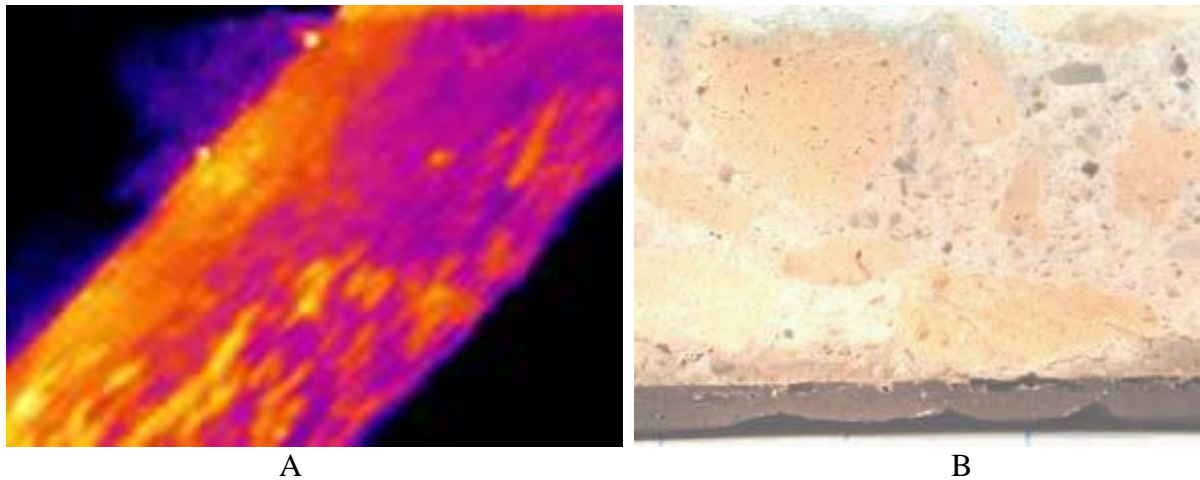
Application of IR thermography to FRP composite, (A) Thermal image of FRP surface showing defects and (B) cross-section view showing air voids [54]
